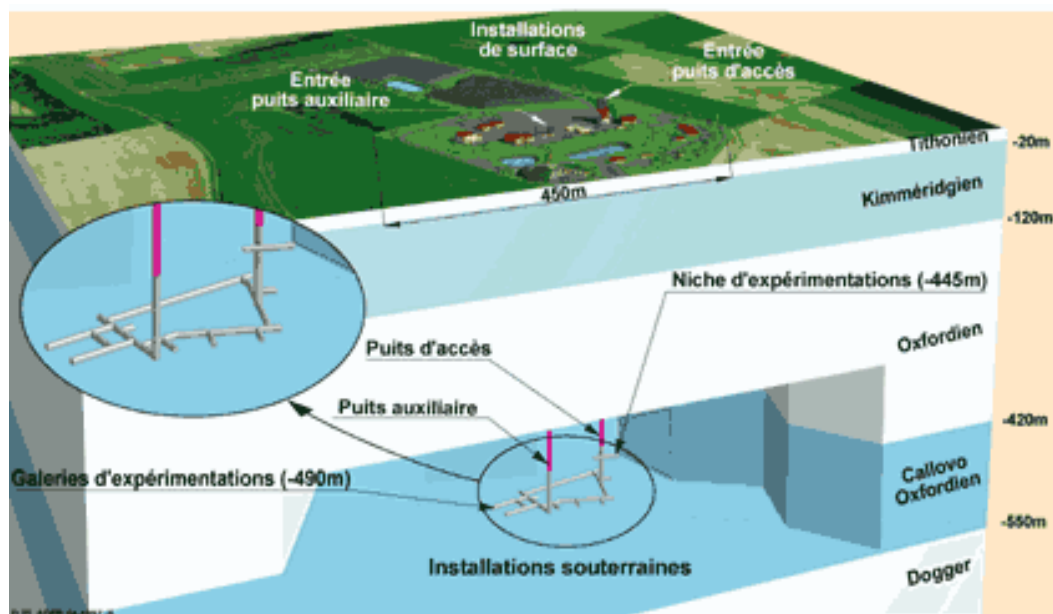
Layout of the Bure underground laboratory (www.andra.fr).
